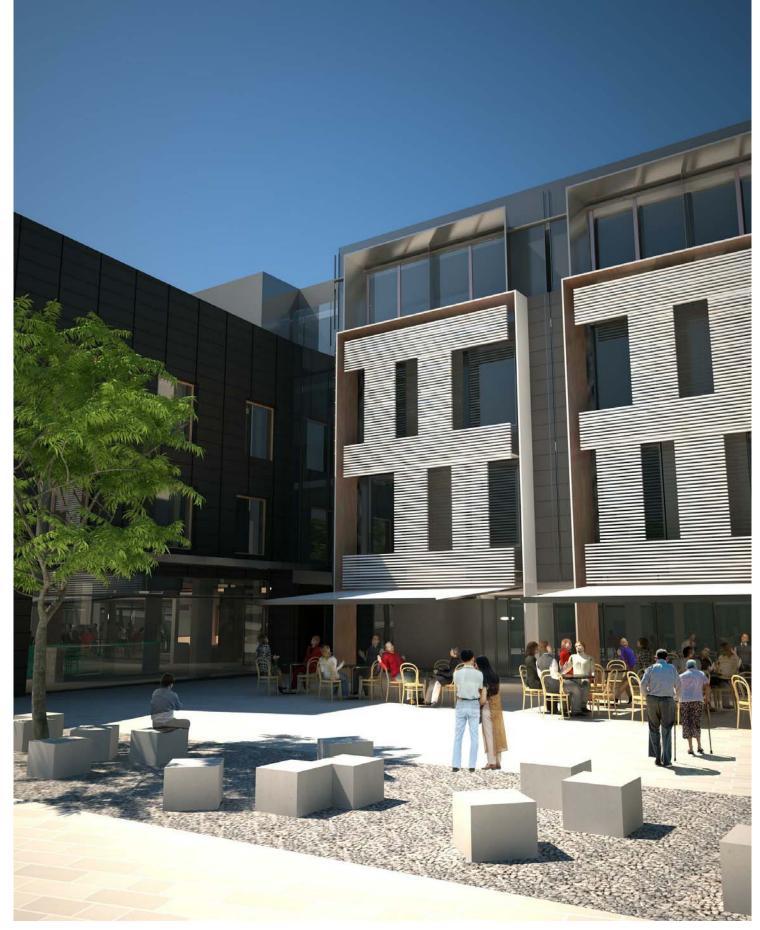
DETAILED PERSPECTIVE - SOUTHERN FACADE & PLAZA - PROPOSED
